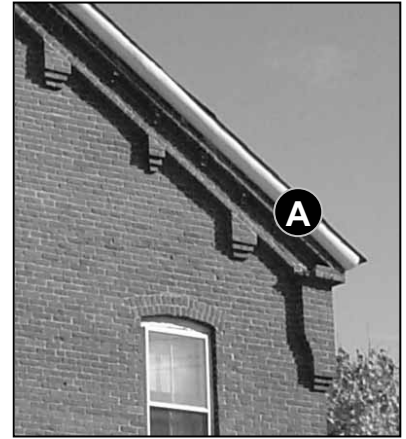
120 Benmont Ave. The eave detail here creates an intricate shadow and helps water drip away from the surface of the façade.
